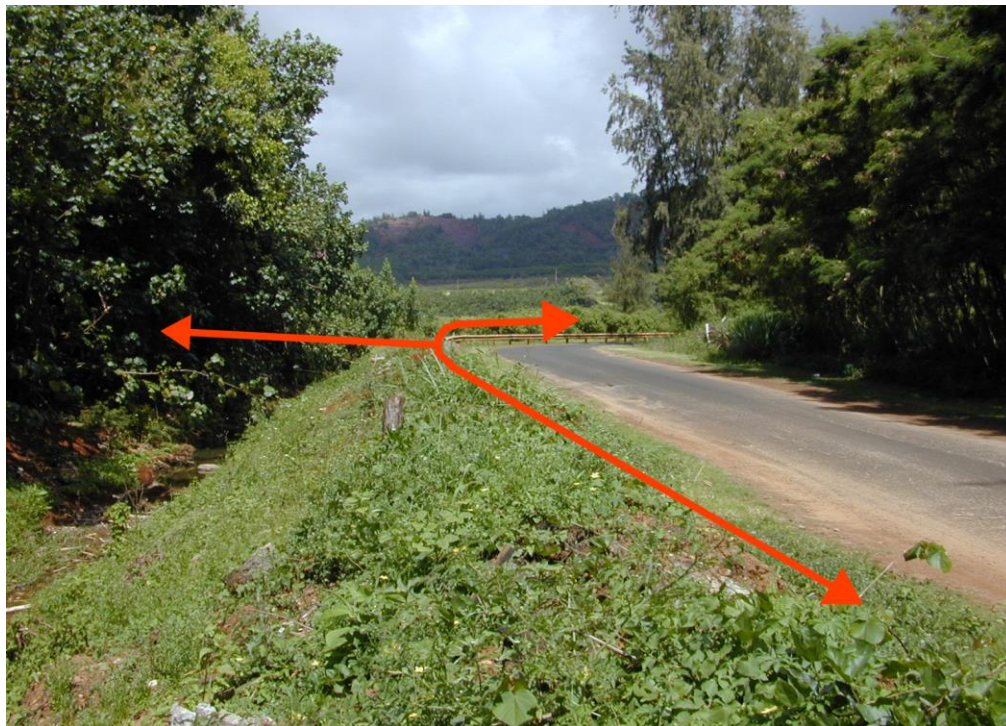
Mauka view of Hilton Lane and location of the proposed path and ditch crossing
